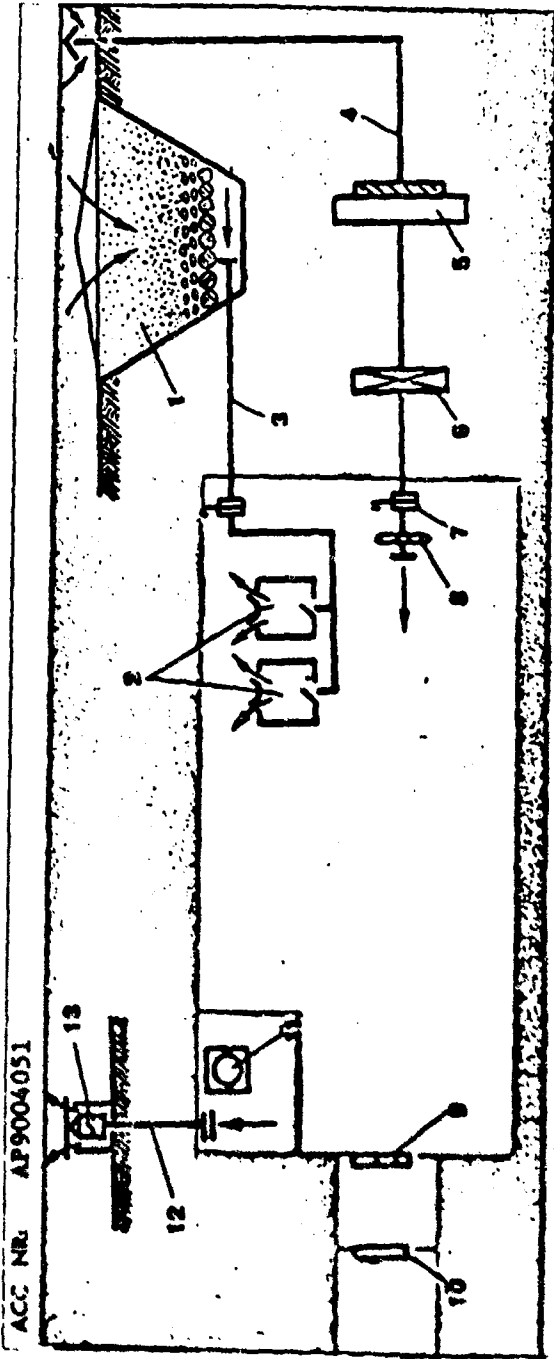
Layout of filtering-ventilating equipment in a shelter.
